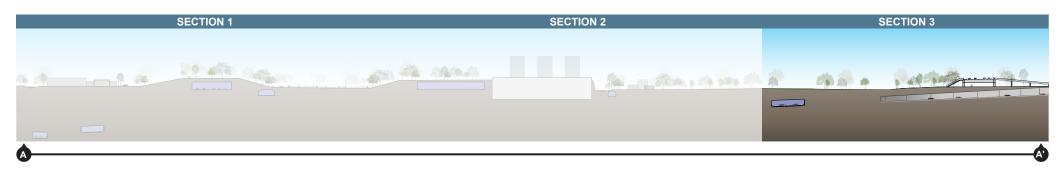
Long-section of the Rozelle Rail Yards - east-west - section 3
